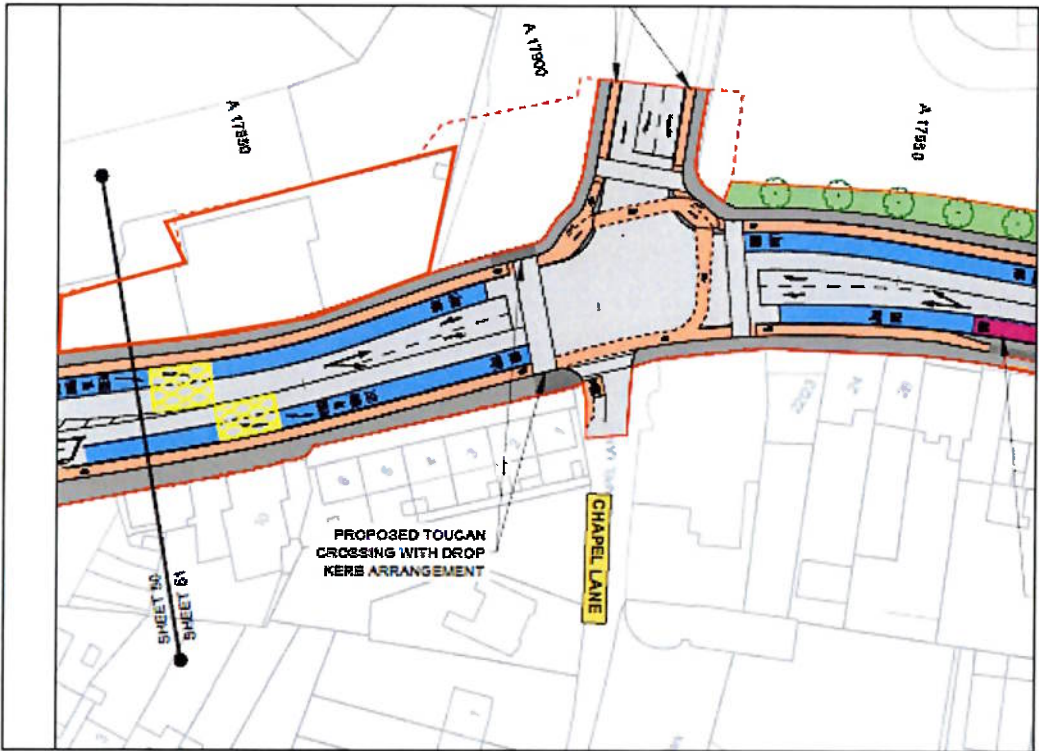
Scheme Plan for Bray, subject site generally outlined in red – East Side - (Source: Jacobs, 2023)
